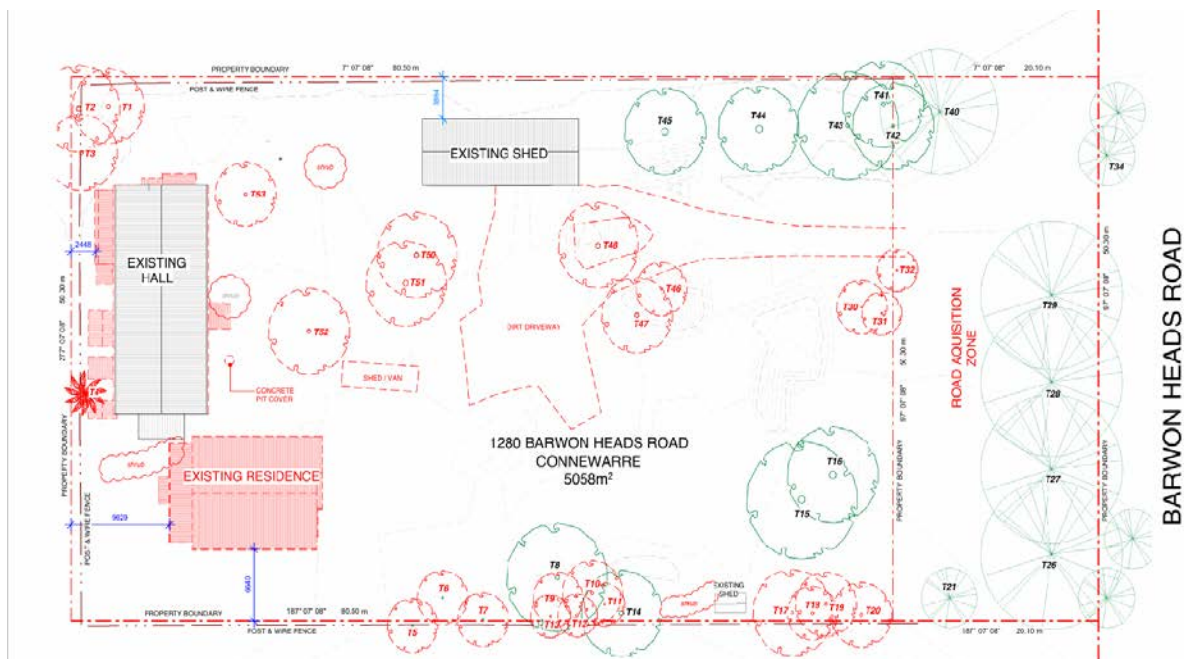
Existing site plan showing the former Hall (west), the existing bungalow to be demolished (south-west), existing sheds, and the surveyed trees (JDA Architects, TP.02).
